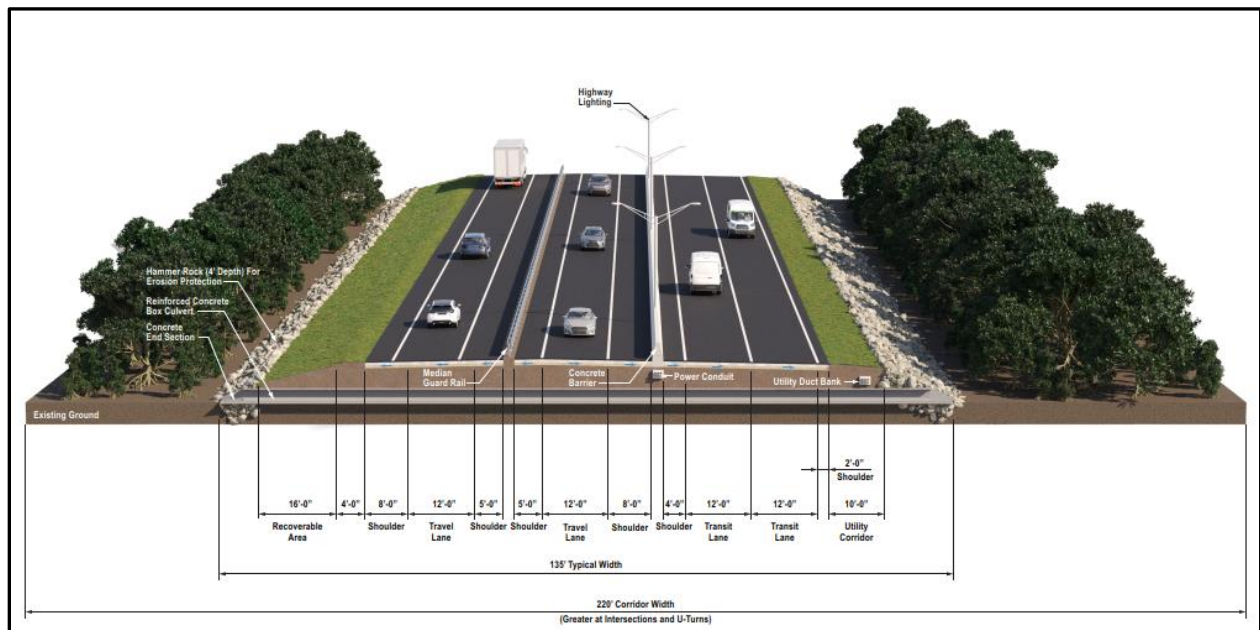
Year 2036 – Typical Sections – Acceptable Fit
